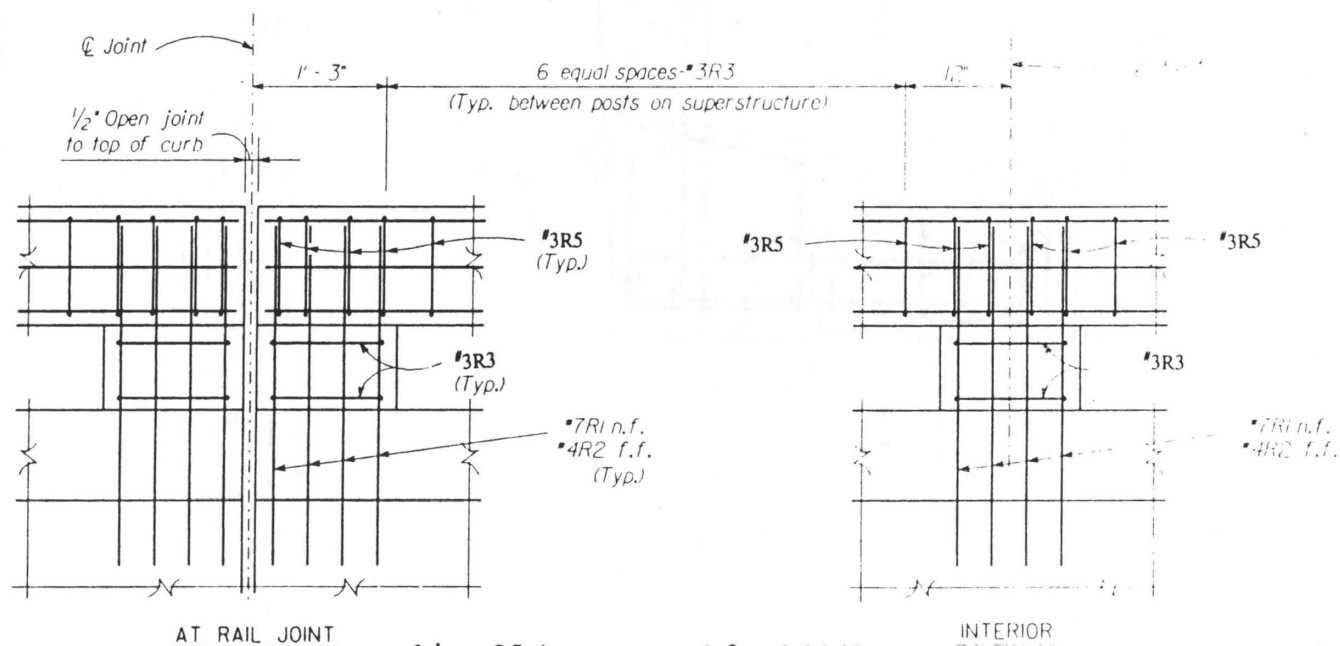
Reinforcement Details for the Concrete Posts in the Natchez Trace Parkway Bridge Rail.
